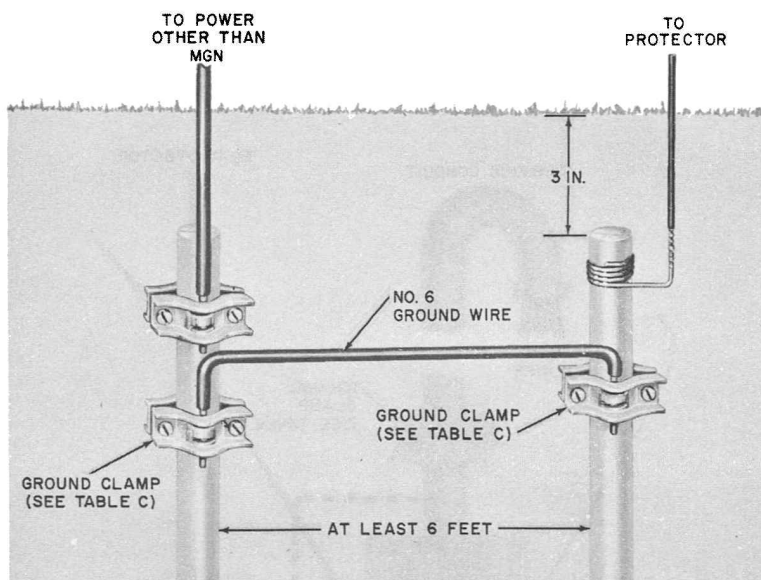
Power Other Than MGN Grounded to Ground Rod—No Water Pipe—Connection to Water Pipe Not Possible
